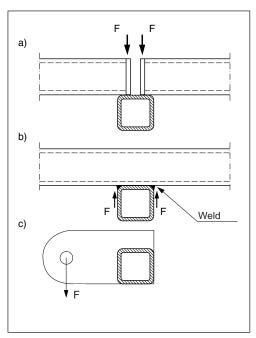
Preventing the distortion of the cross-section in a hollow section
